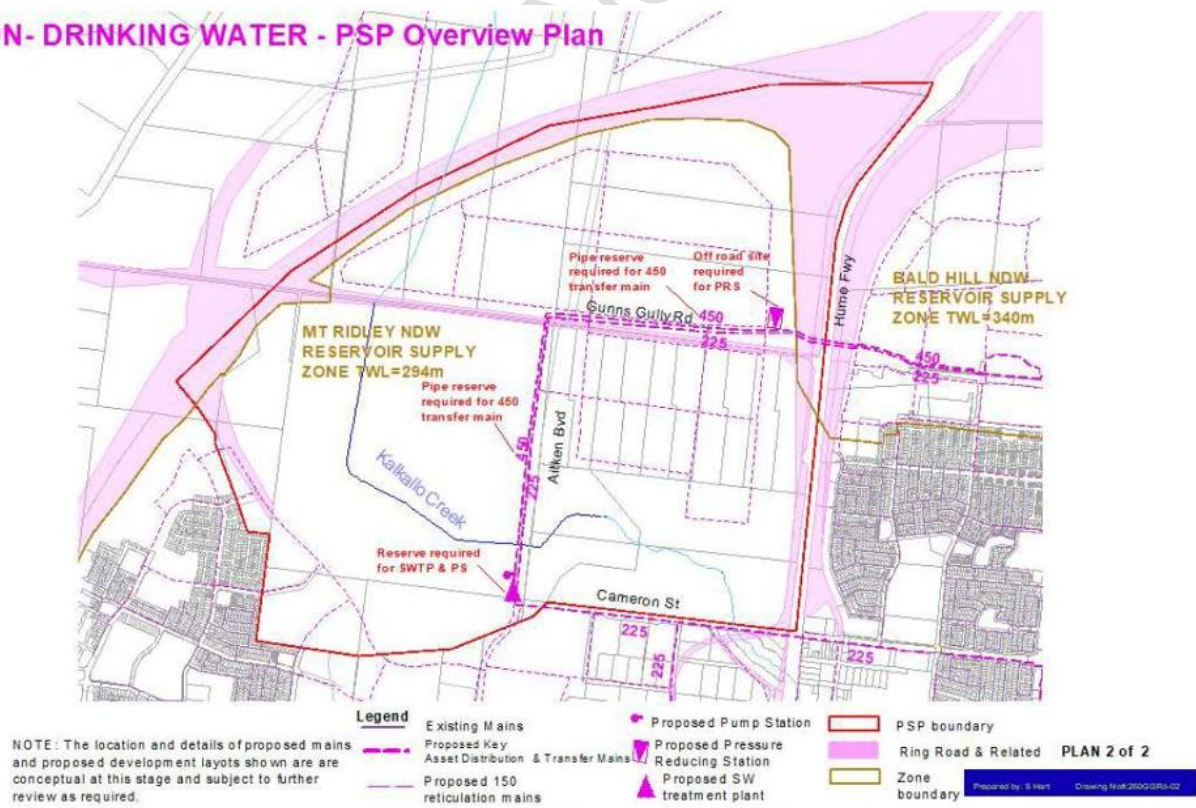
YVW Non-Drinking Water Concept Plan (Source: Utility Servicing Assessment 2026, SMEC)
